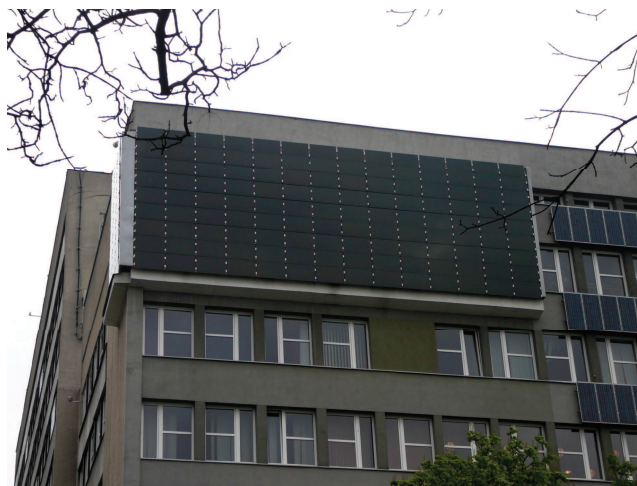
PV façade installation on the Environmental Engineering Faculty building of Warsaw University of Technology (photo: Grażyna Frydrychowicz-Jastrzębska)
